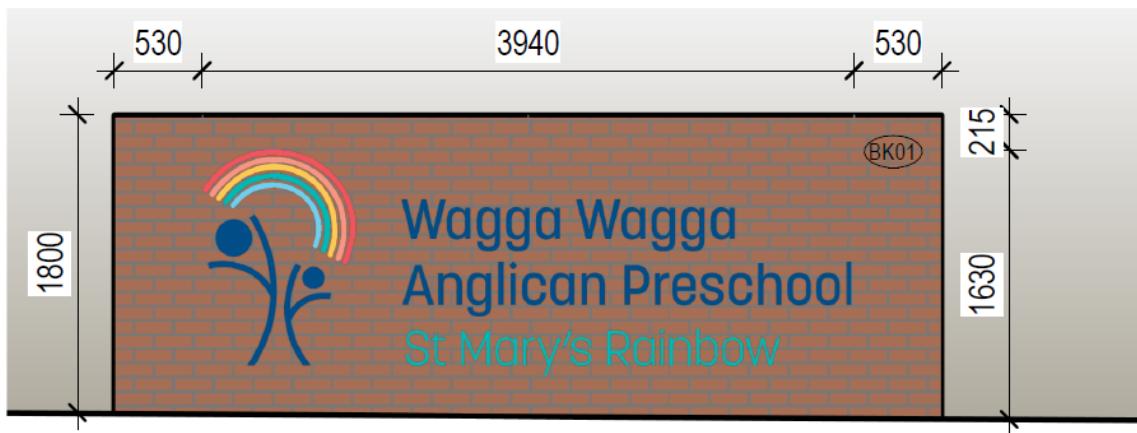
Proposed signage (Source: Extract from Gray Puksand Elevations Plan)
